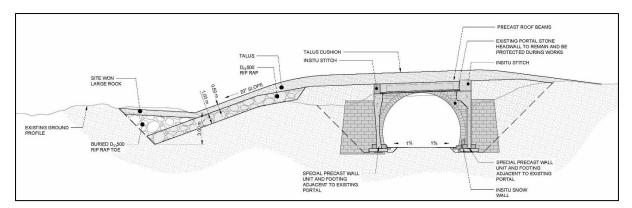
Section drawing showing the stone tunnel portal façade visible at the western end of the new avalanche shelter (not to scale).⁷²
